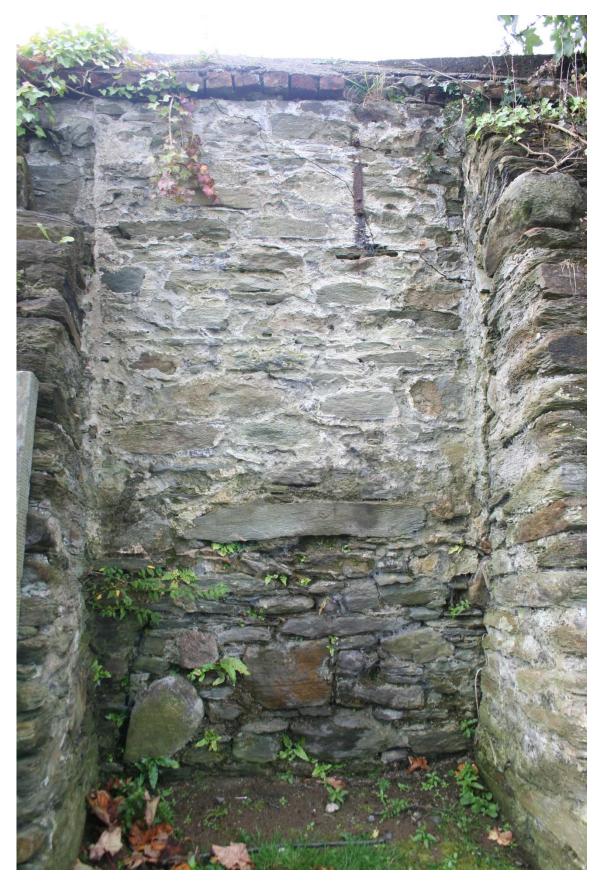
Area of mortar and lintel stone visible on the north facing wall of St Augustine's graveyard (the excavation trench is over the other side of the wall).
